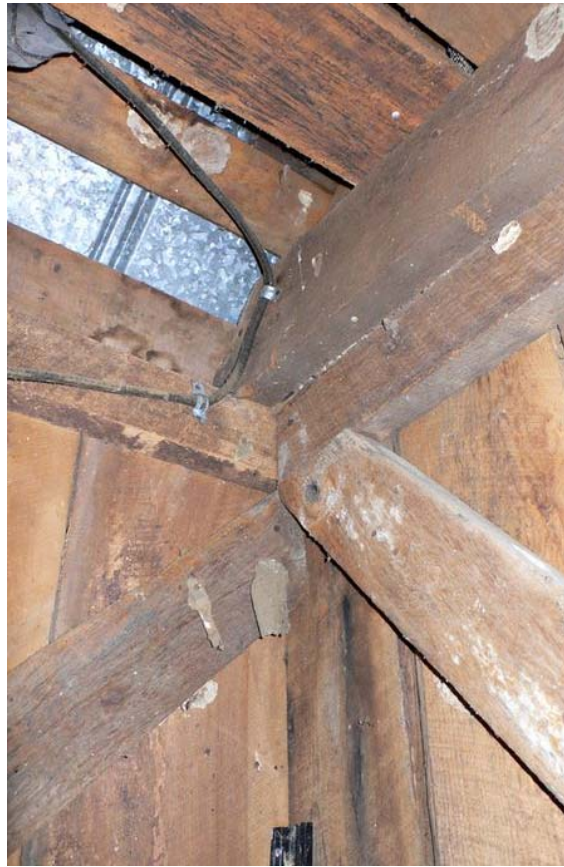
MN 685, Frame House, late nineteenth century Gravel Switch vicinity. Detail of interior corner bracing in a vertical plank frame building.
